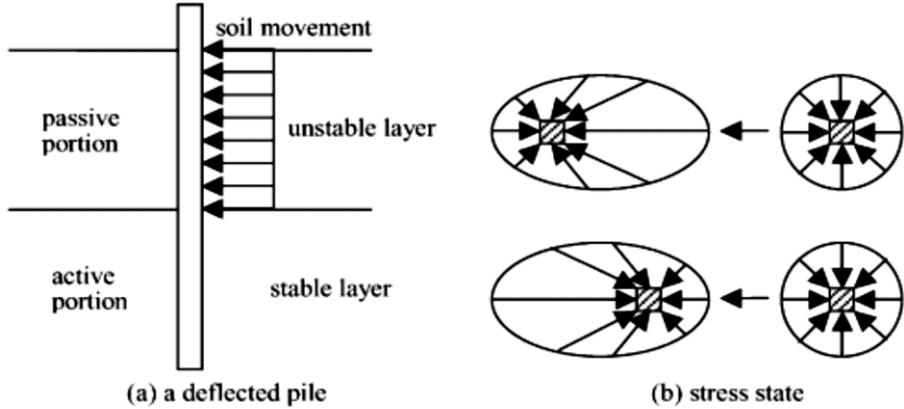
A pile undergoing lateral soil movement — (a) A deflected pile; (b) Stress state (after Jeong et al., 2003).
